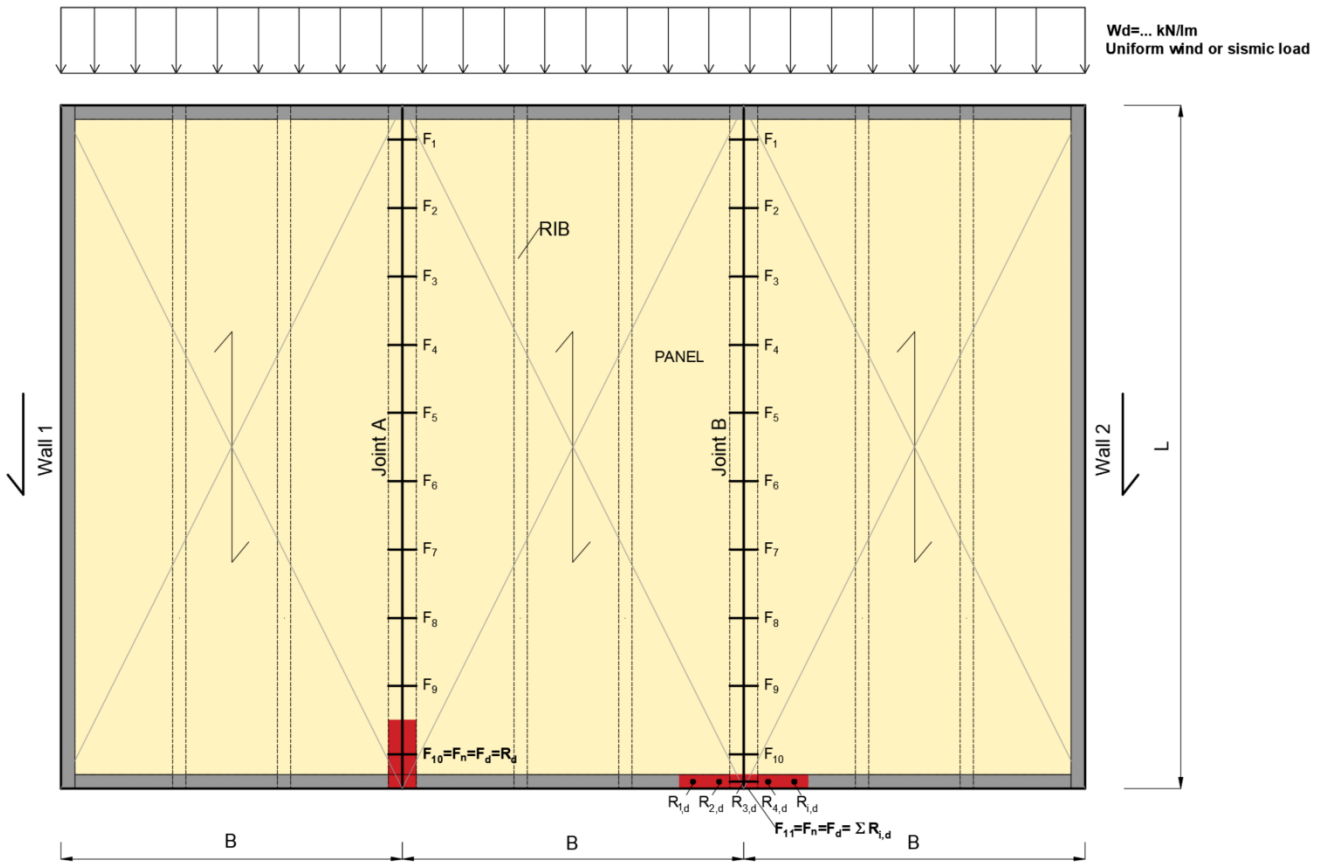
n: Fasteners placed in longitudinal joints and determination of the design carrying capacity of the outermost lying fastener  $F_d$  – Left (Joint A): Single fastener at the end; Right (Joint B): Multiple fasteners at the end .
